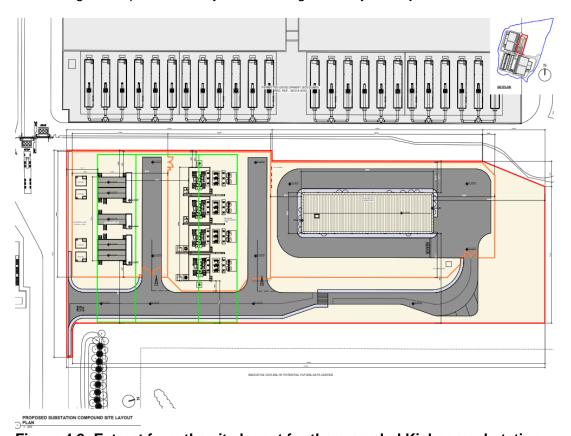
Extract from the site layout for the amended Kishoge substation
